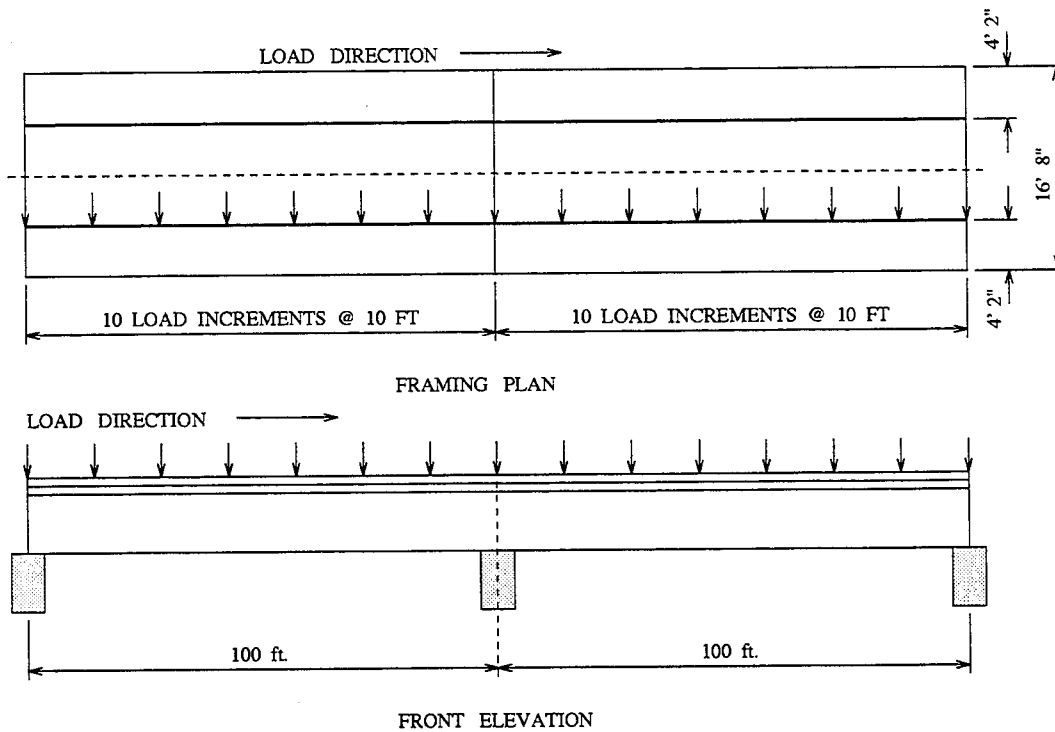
Plan and Front Elevation of Bridge with Moving Live Load
